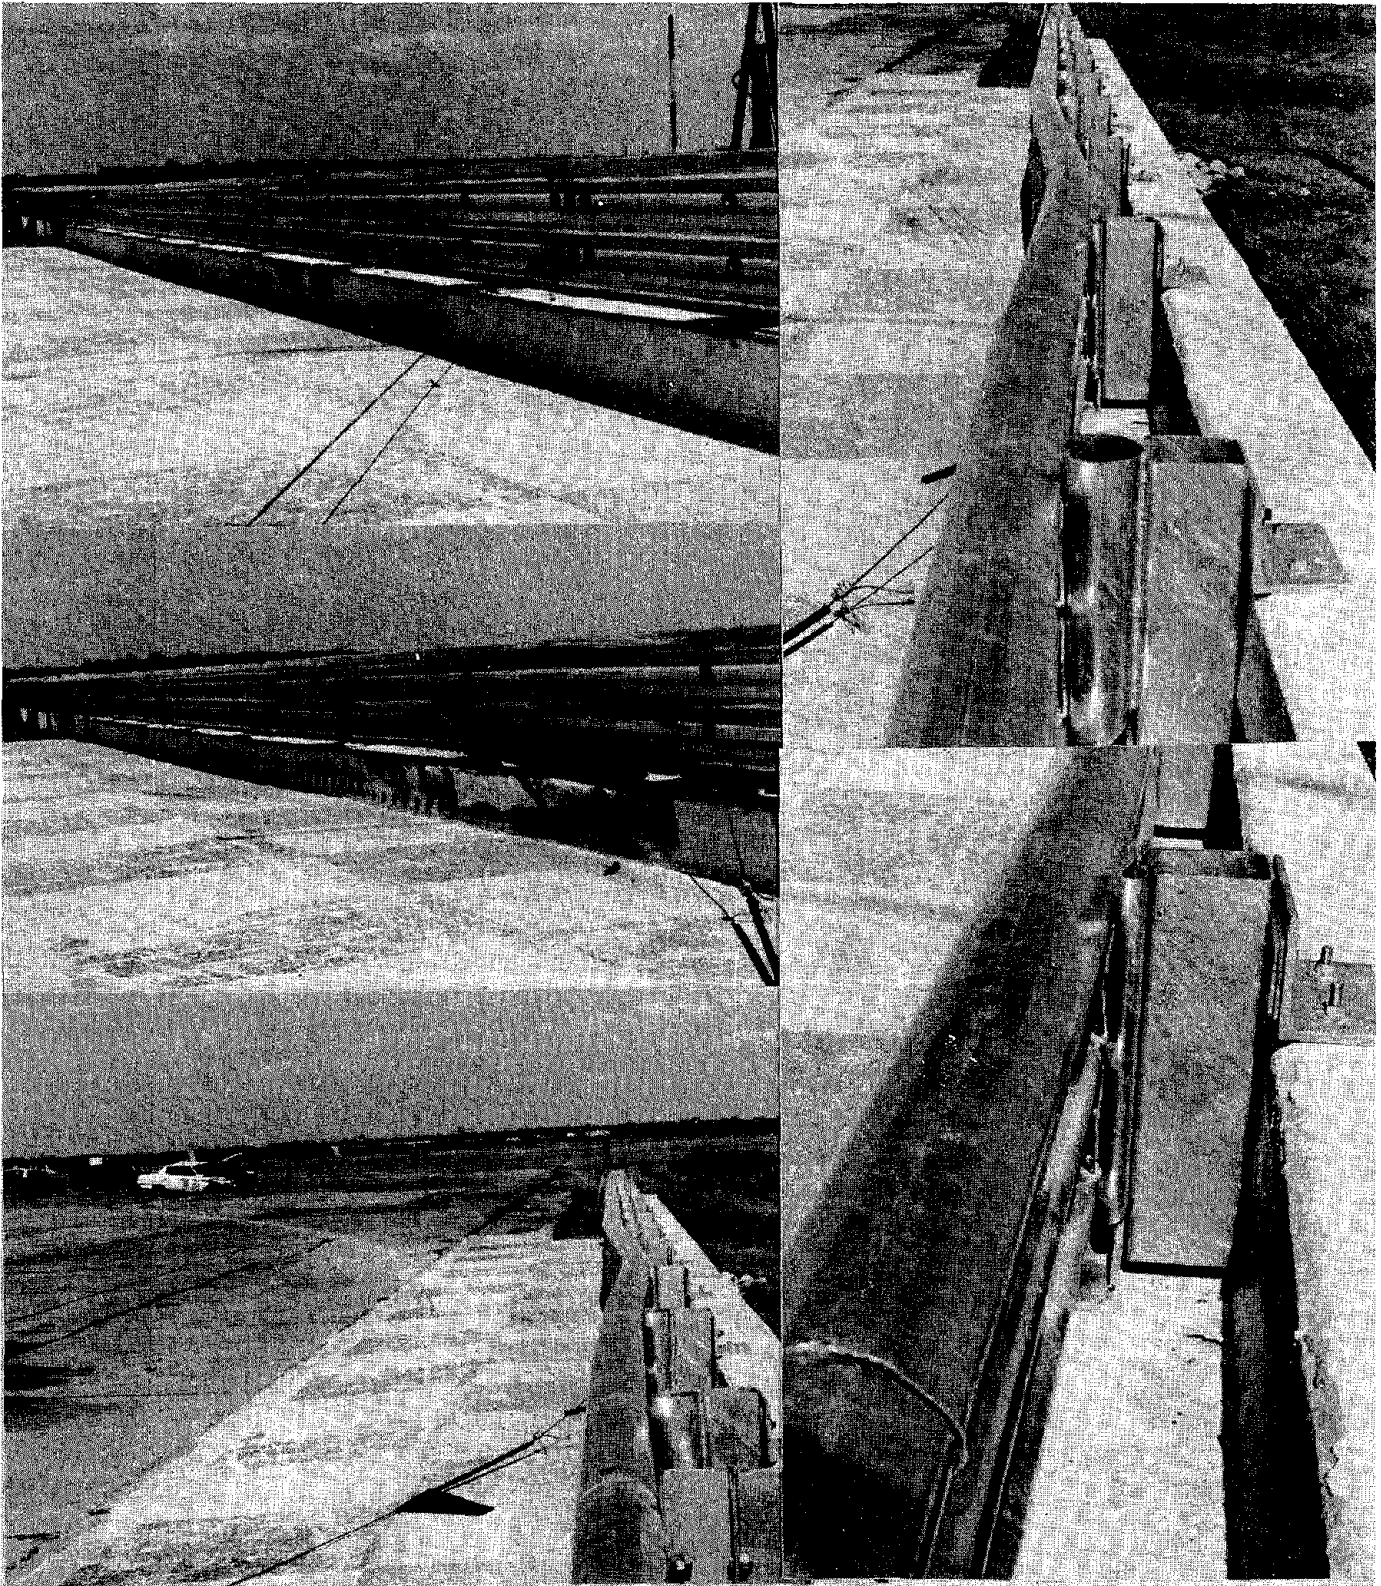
VIEWS OF TEST RF-2 INSTALLATION DAMAGE
